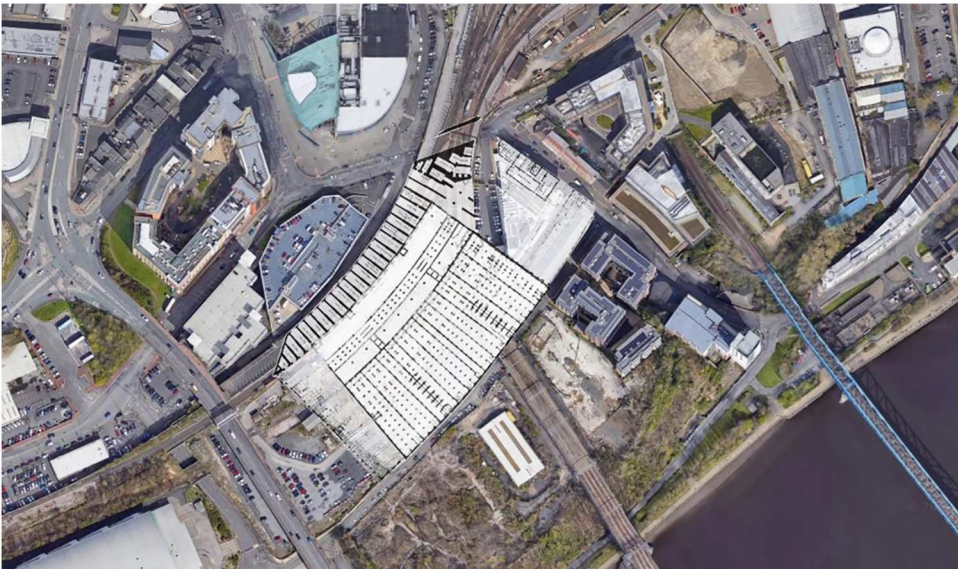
Aerial Photo Showing Forth Goods Yard Station's superposed 1866 foundation plan (Gow 2009) and 1920 drawing of the Forth Banks site with the viaduct, 1904 offices and 1907 warehouse extensions (Gow 2009).
